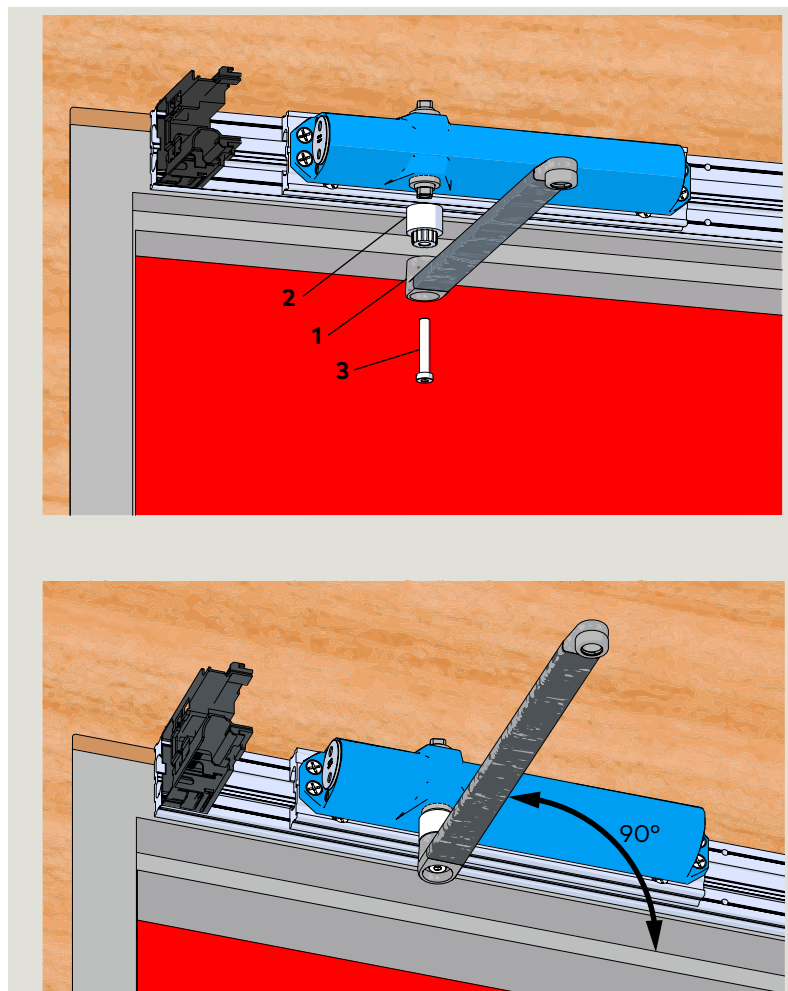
Closer adapter and closer assembled to backplate
